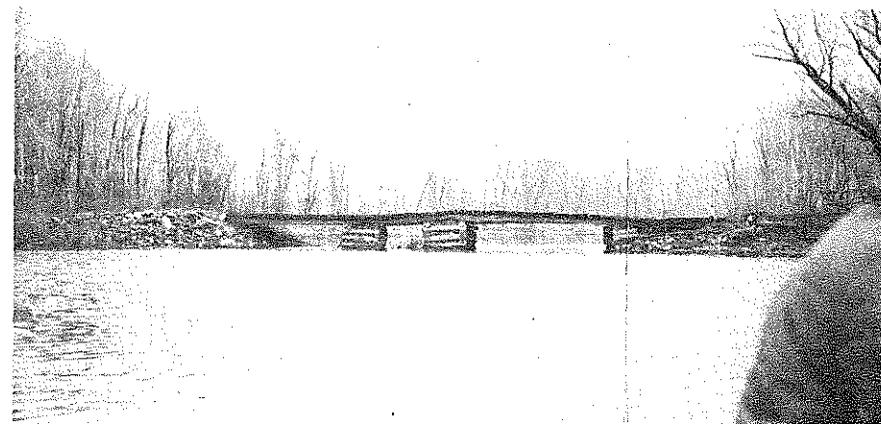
LOOKING DOWNSTREAM FROM BRIDGE #1
